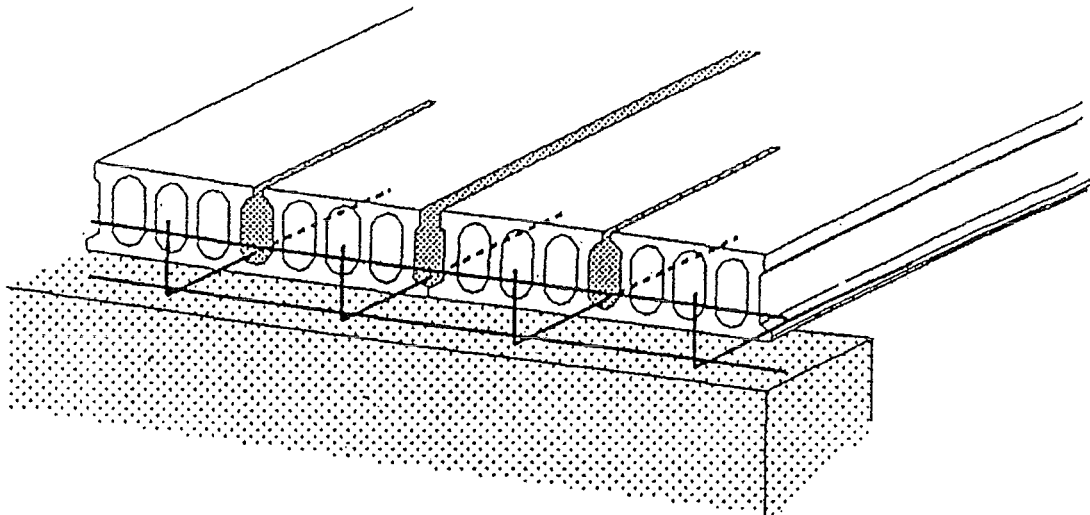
FIB recommended details for the support of hollow-core floor units (FIB, 2000)
